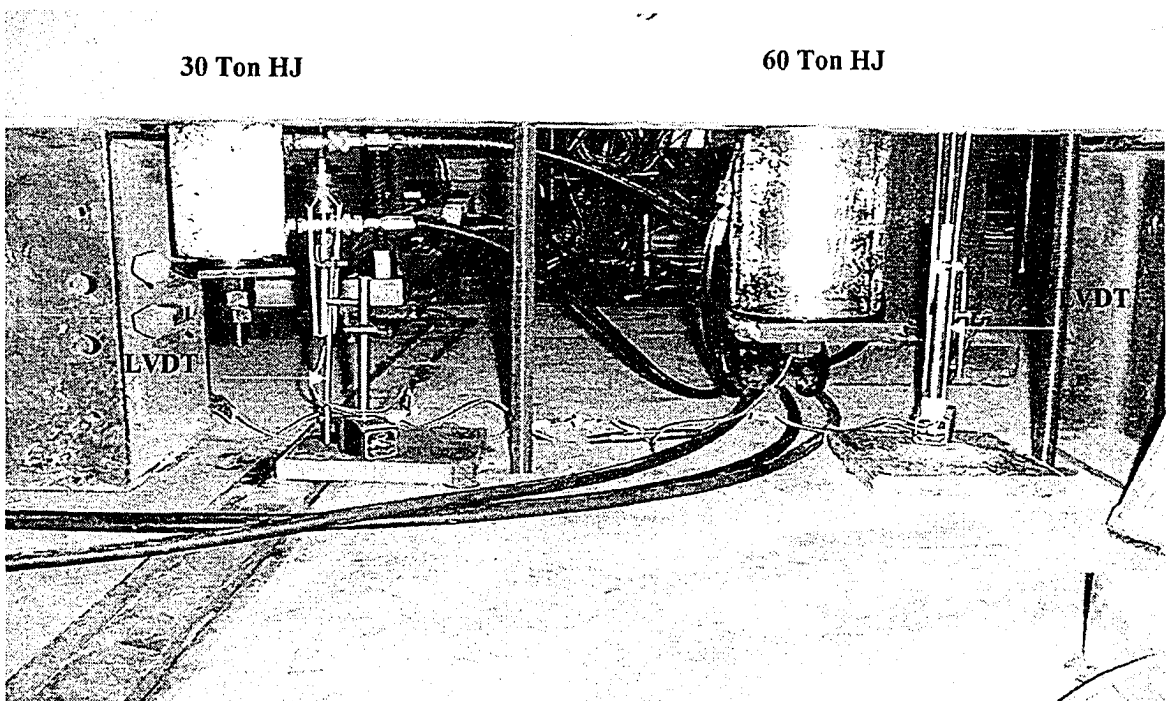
Load Transfer from Specimen to Lab-Strong Floor
